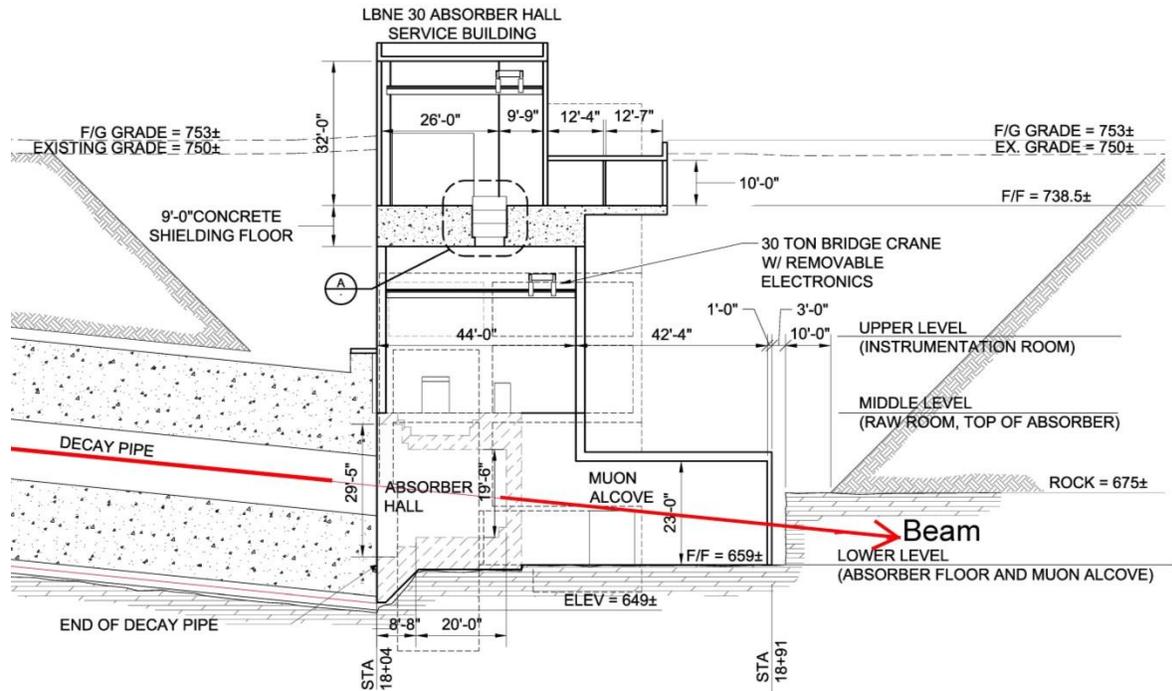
Absorber Hall longitudinal cross section cut along the Decay Pipe centerline.
